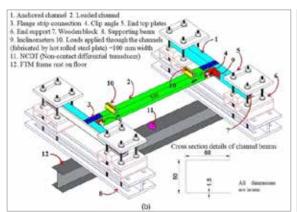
CFS beam-to beam connection with clipangle and flange-strip
